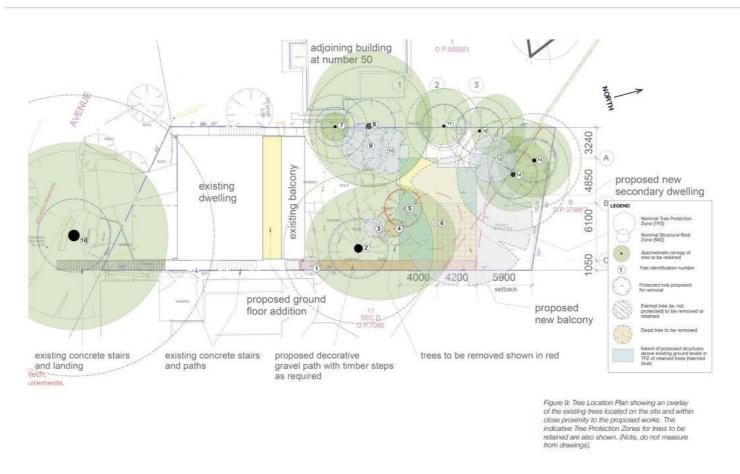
Indicates a schematic representation of the subject property showing the existing house footprint as well as the proposed secondary dwelling house footprint layout as well as existing canopy trees and their respective TPZ's (Tree Protection Zones) (trees numbered as in the arboricultural assessment of the proposal by Willis 2022)
